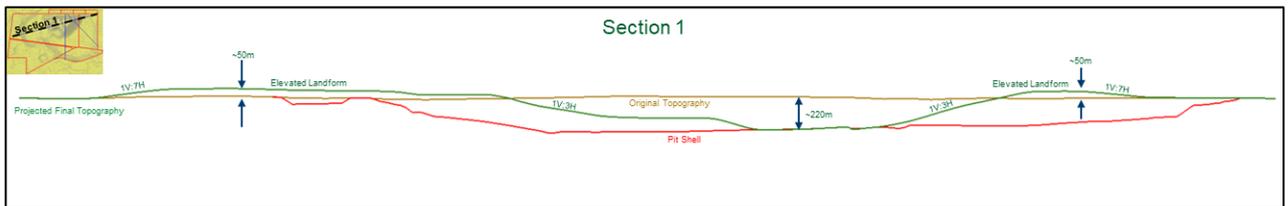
Section 1 – Elevated waste dump area (including CDA on western side) and partially backfilled pit
